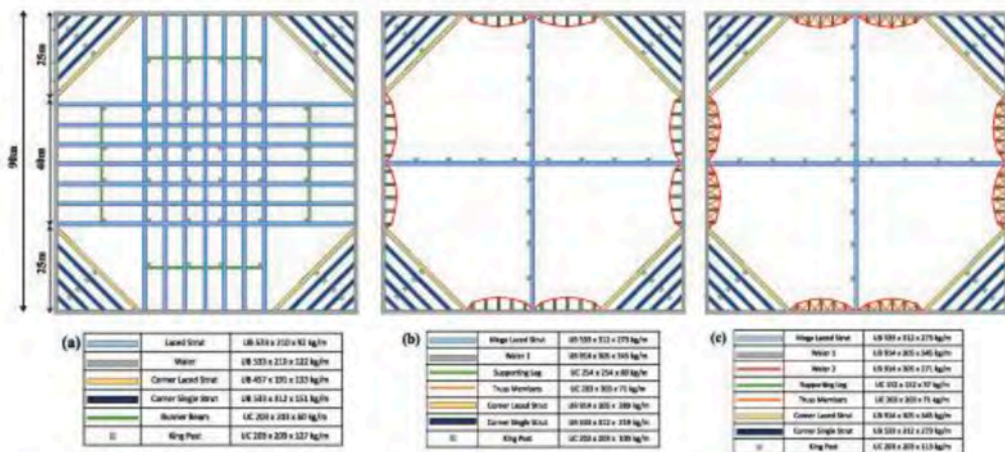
Layout of 90 mx 90 m site supported by (a) Conventional Strut and Waler (b) IPS system (c) PWS system.
